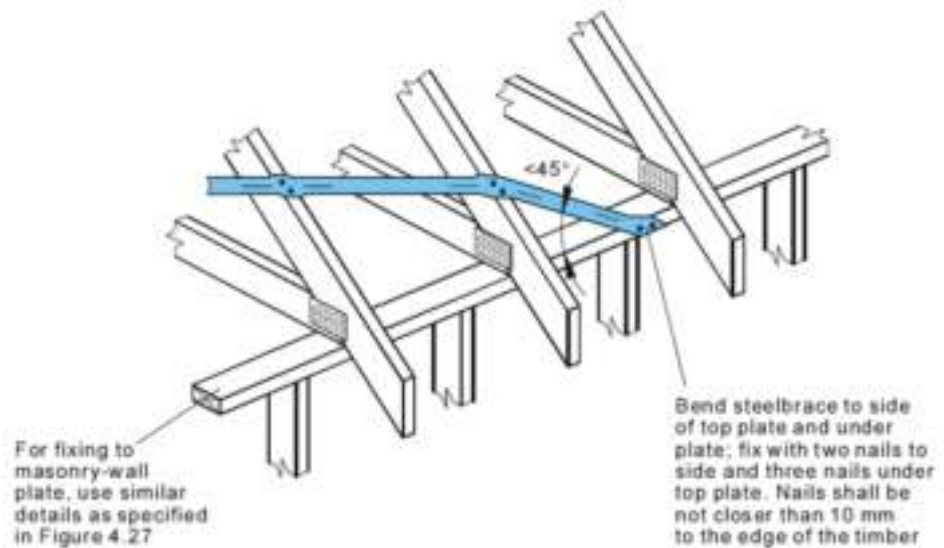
END FIXING DETAILS AT HEEL—TO TOP PLATE
